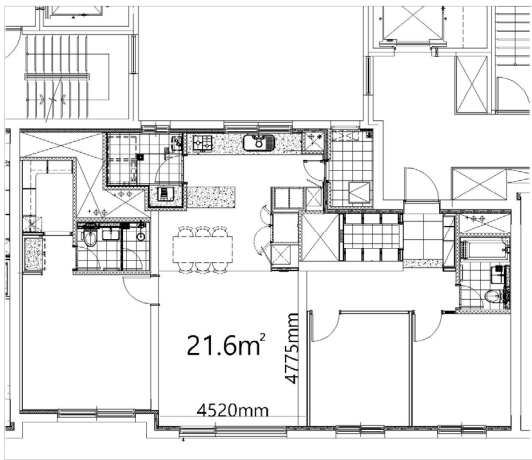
Floor plan of the unit B(84 m<sup>2</sup>, 4 bay)
